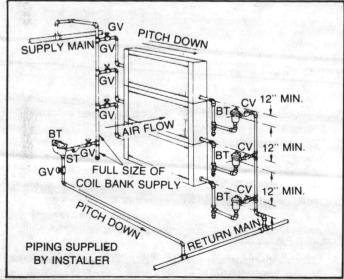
Typical Piping for Type A Steam Coils, High Pressure, Horizontal Tubes for Horizontal Airflow
